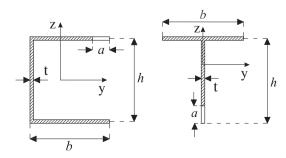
Cross-sectional shapes used and its corresponding crack dispositions.
